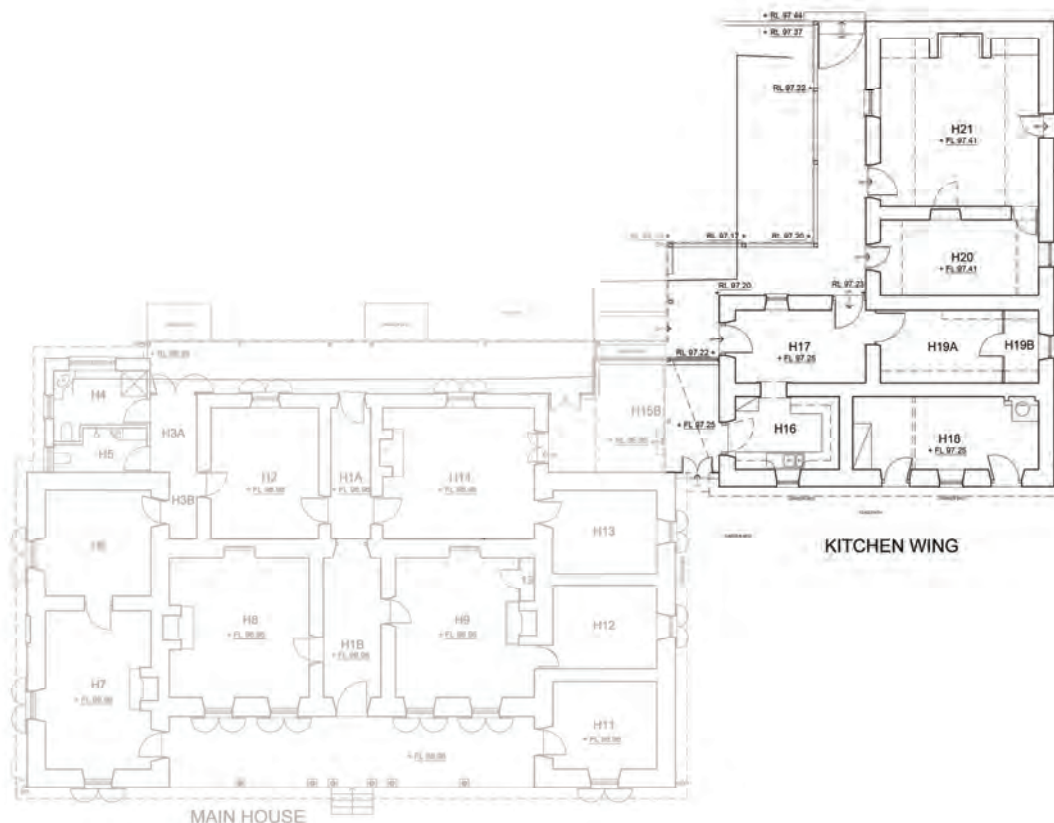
189: Measured floor plan of Kitchen Wing. Source: LSJ Architects.
